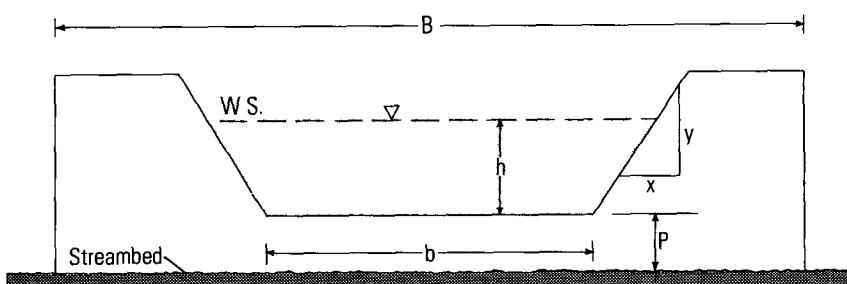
Sketch of upstream face of a trapezoidal weir.
